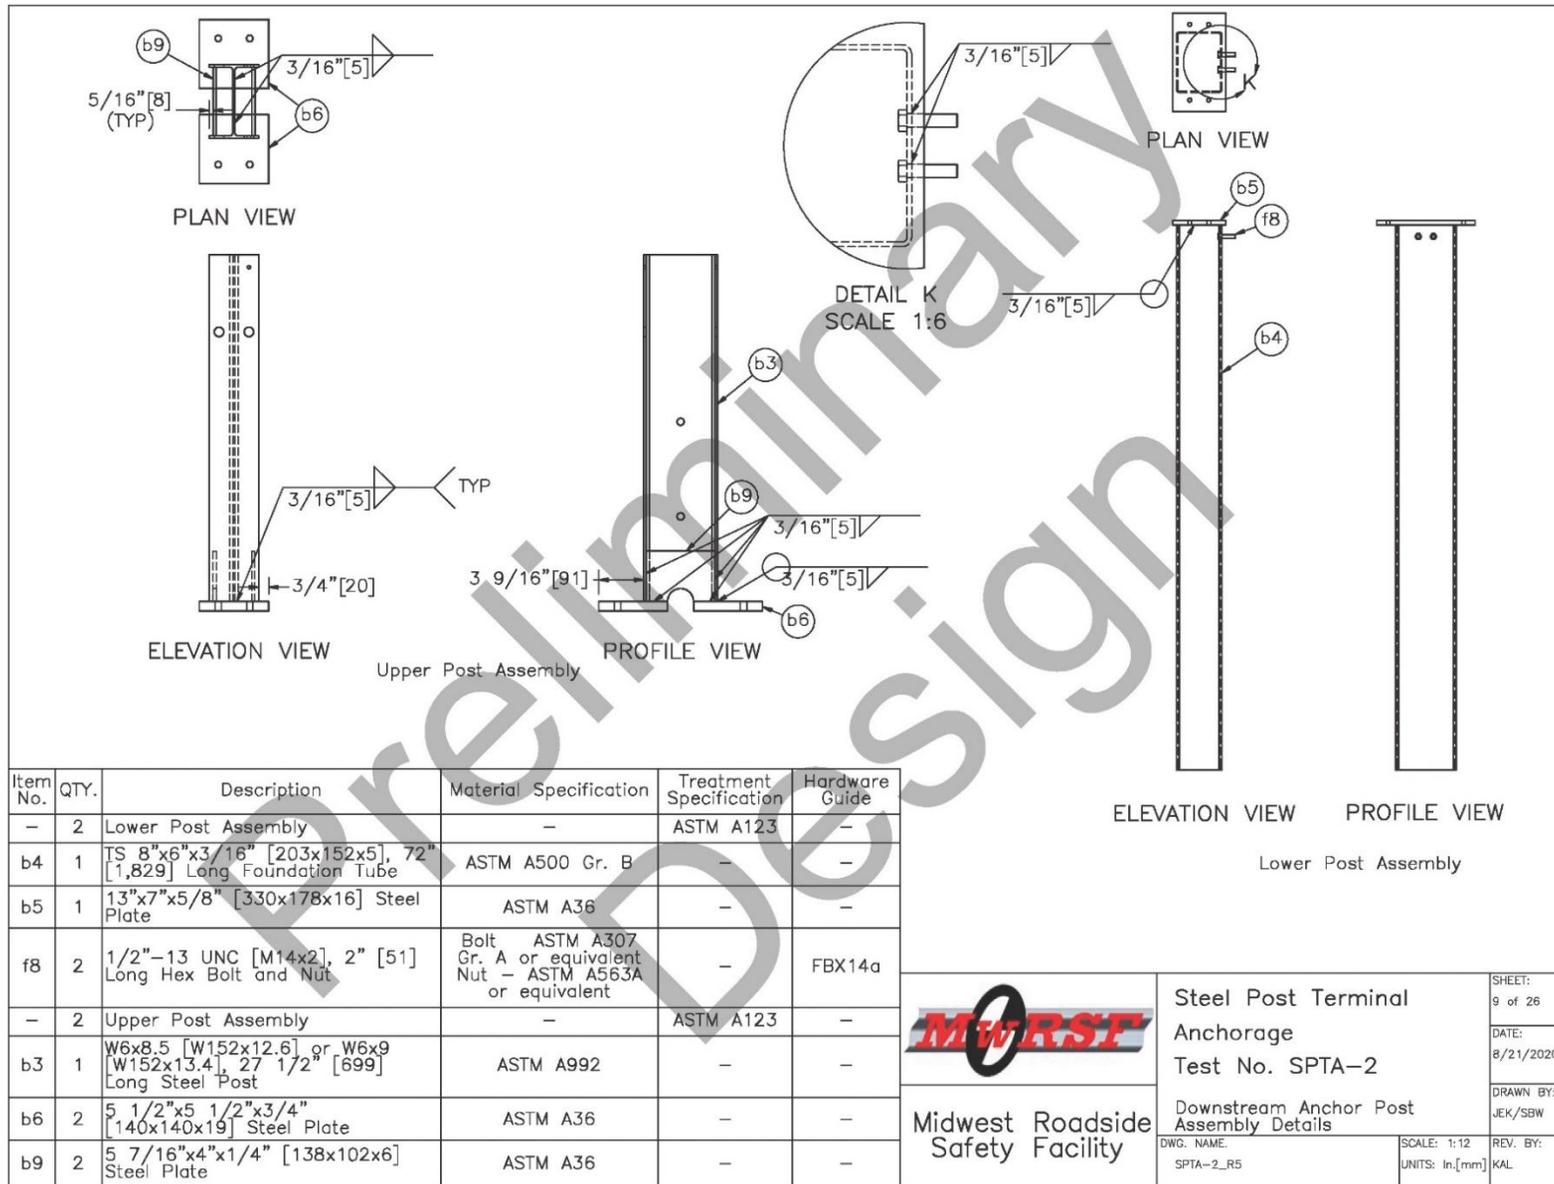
Downstream Anchor Post Assembly Details, Test No. SPTA-2
